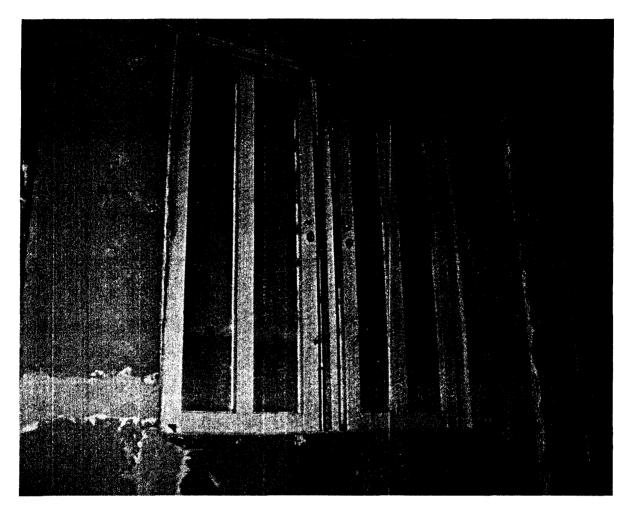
Showing the unexposed face of the access panel door prior to the test.
